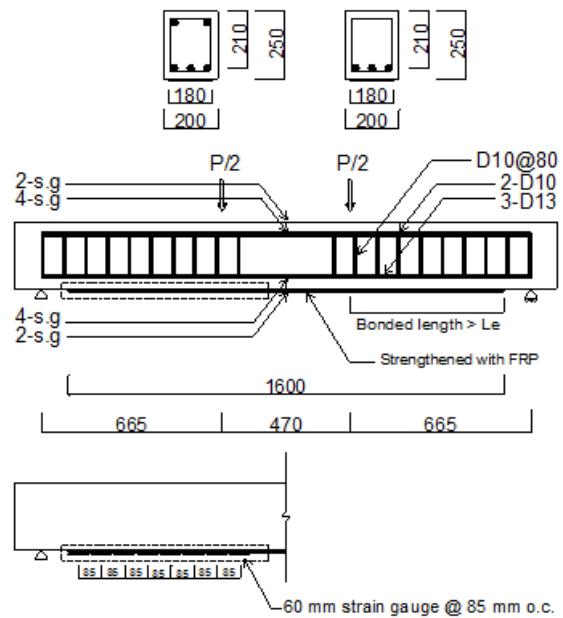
Cross-sections, test setup and strain gauge installation for RC beams
